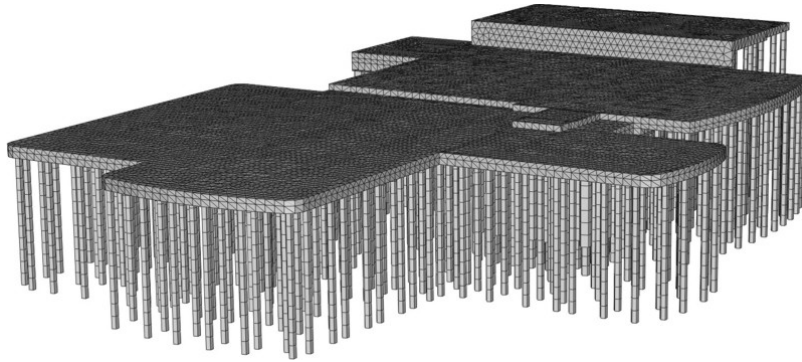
3d diagram of how the piles are connected to the raft to form the foundation.
